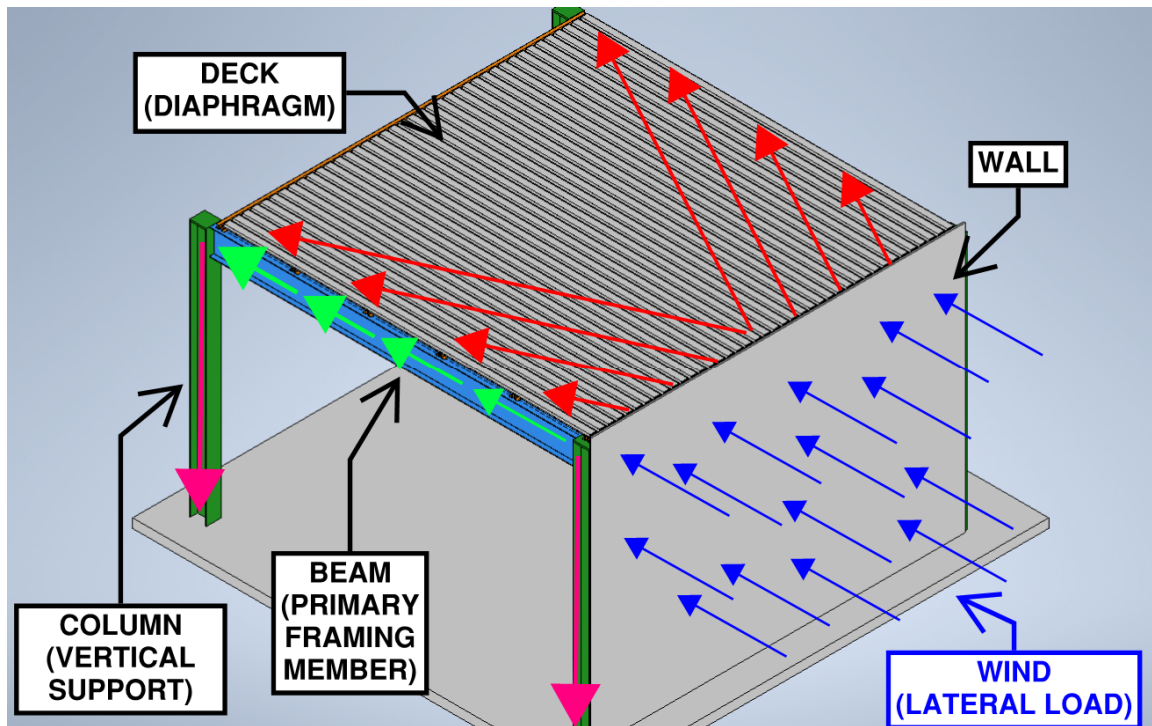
Lateral Wind Load Carried Through the Structure to the Ground
